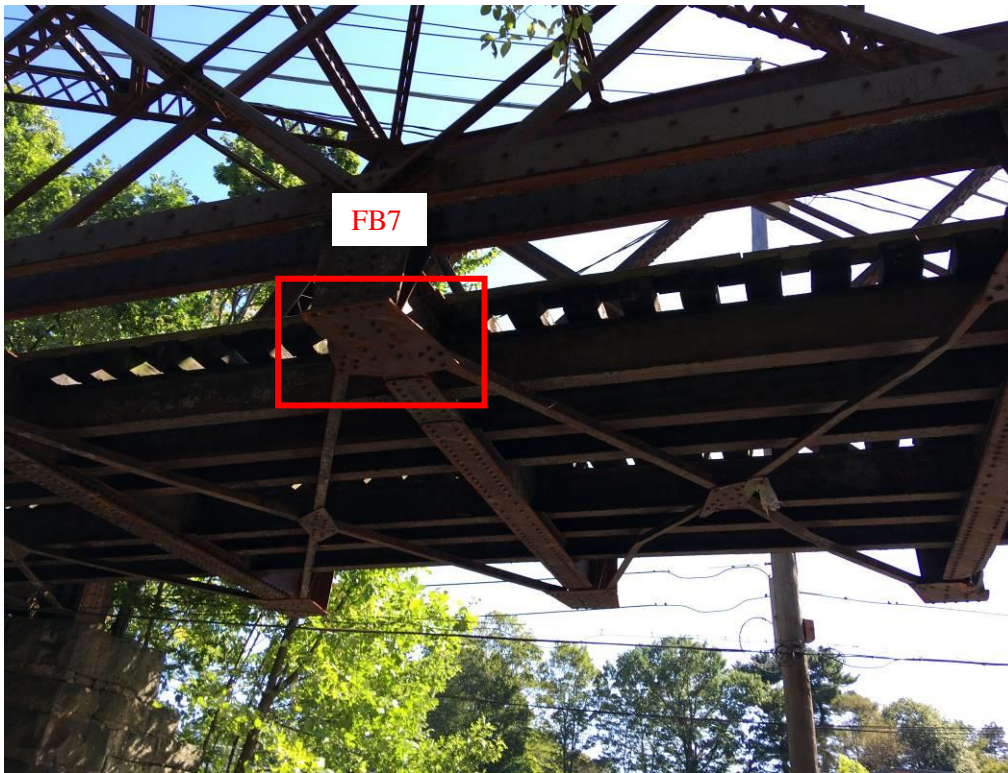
Floor beam 7, north side, looking south. — Replace north gusset plate.
